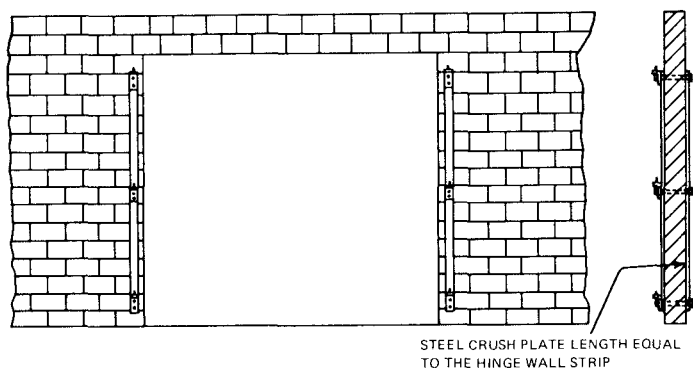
Hollow concrete masonry wall prepared for doors swinging in pairs — lap mounted.
